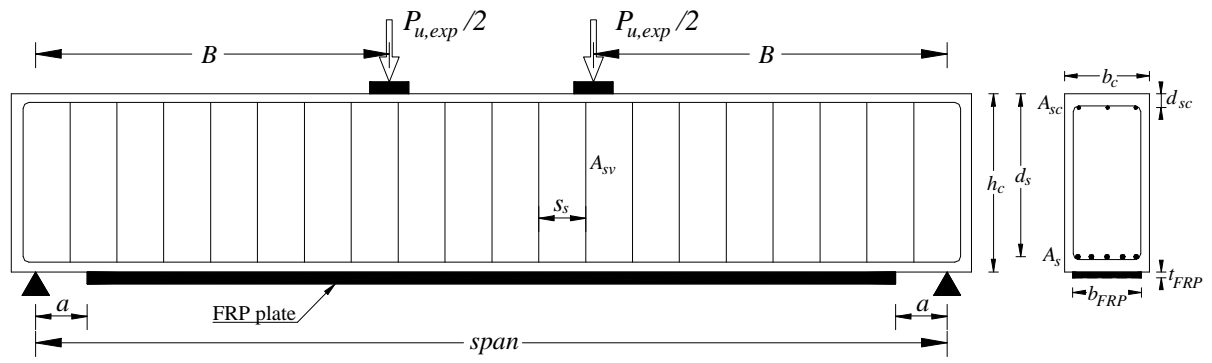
Geometrical and loading configuration of FRP strengthened RC beam.
